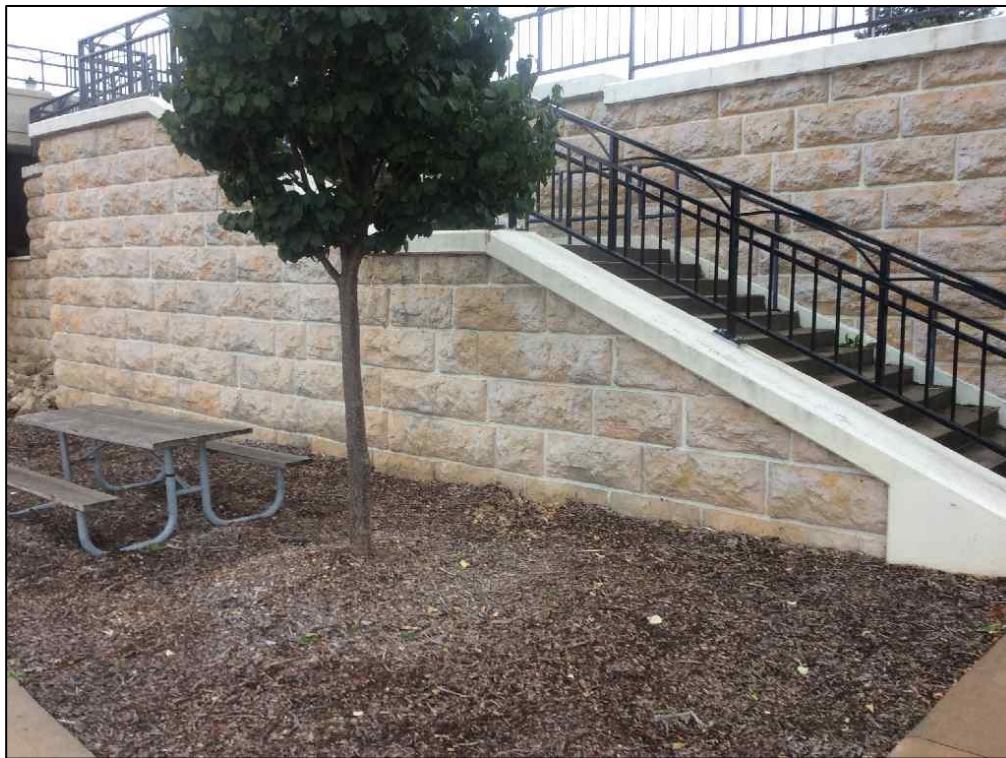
Stairwell integral to Retaining Wall.
